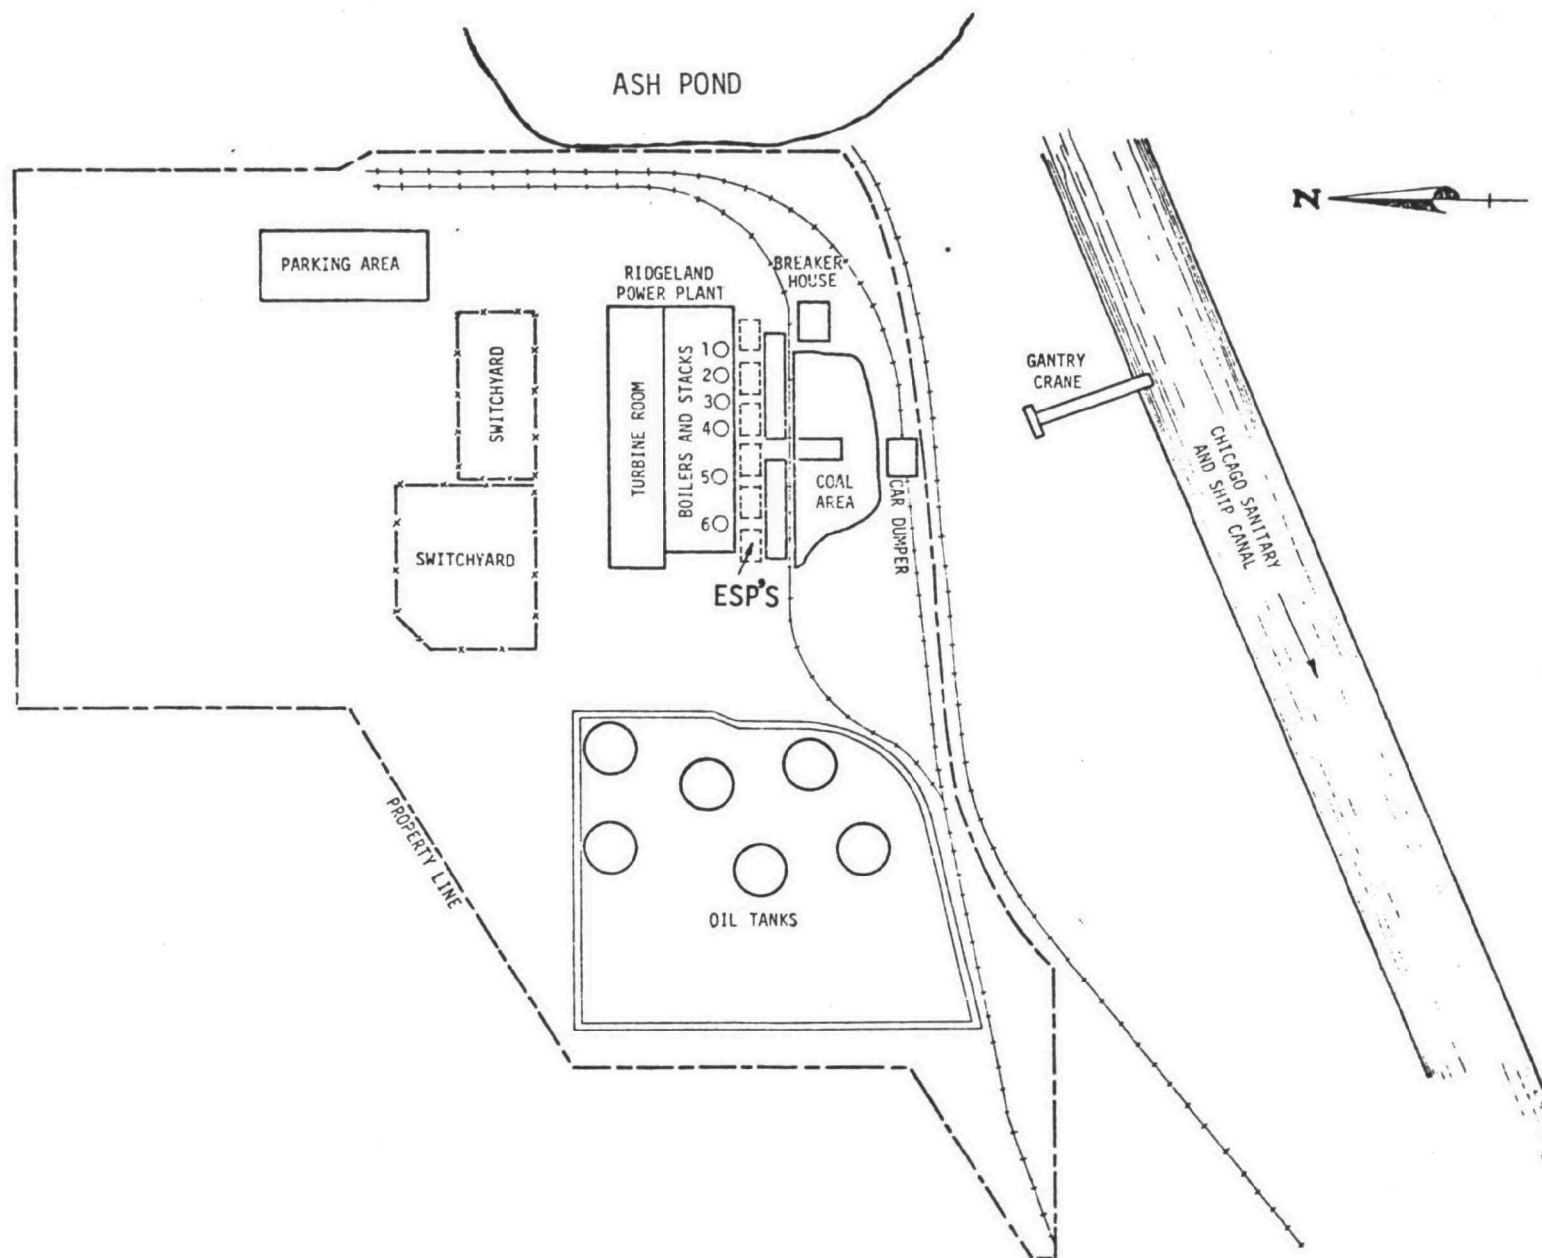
Site plan showing possible locations of new ESP's for Boilers 1, 2, 3, 4, 5, and 6 at the Ridgeland power plant.
